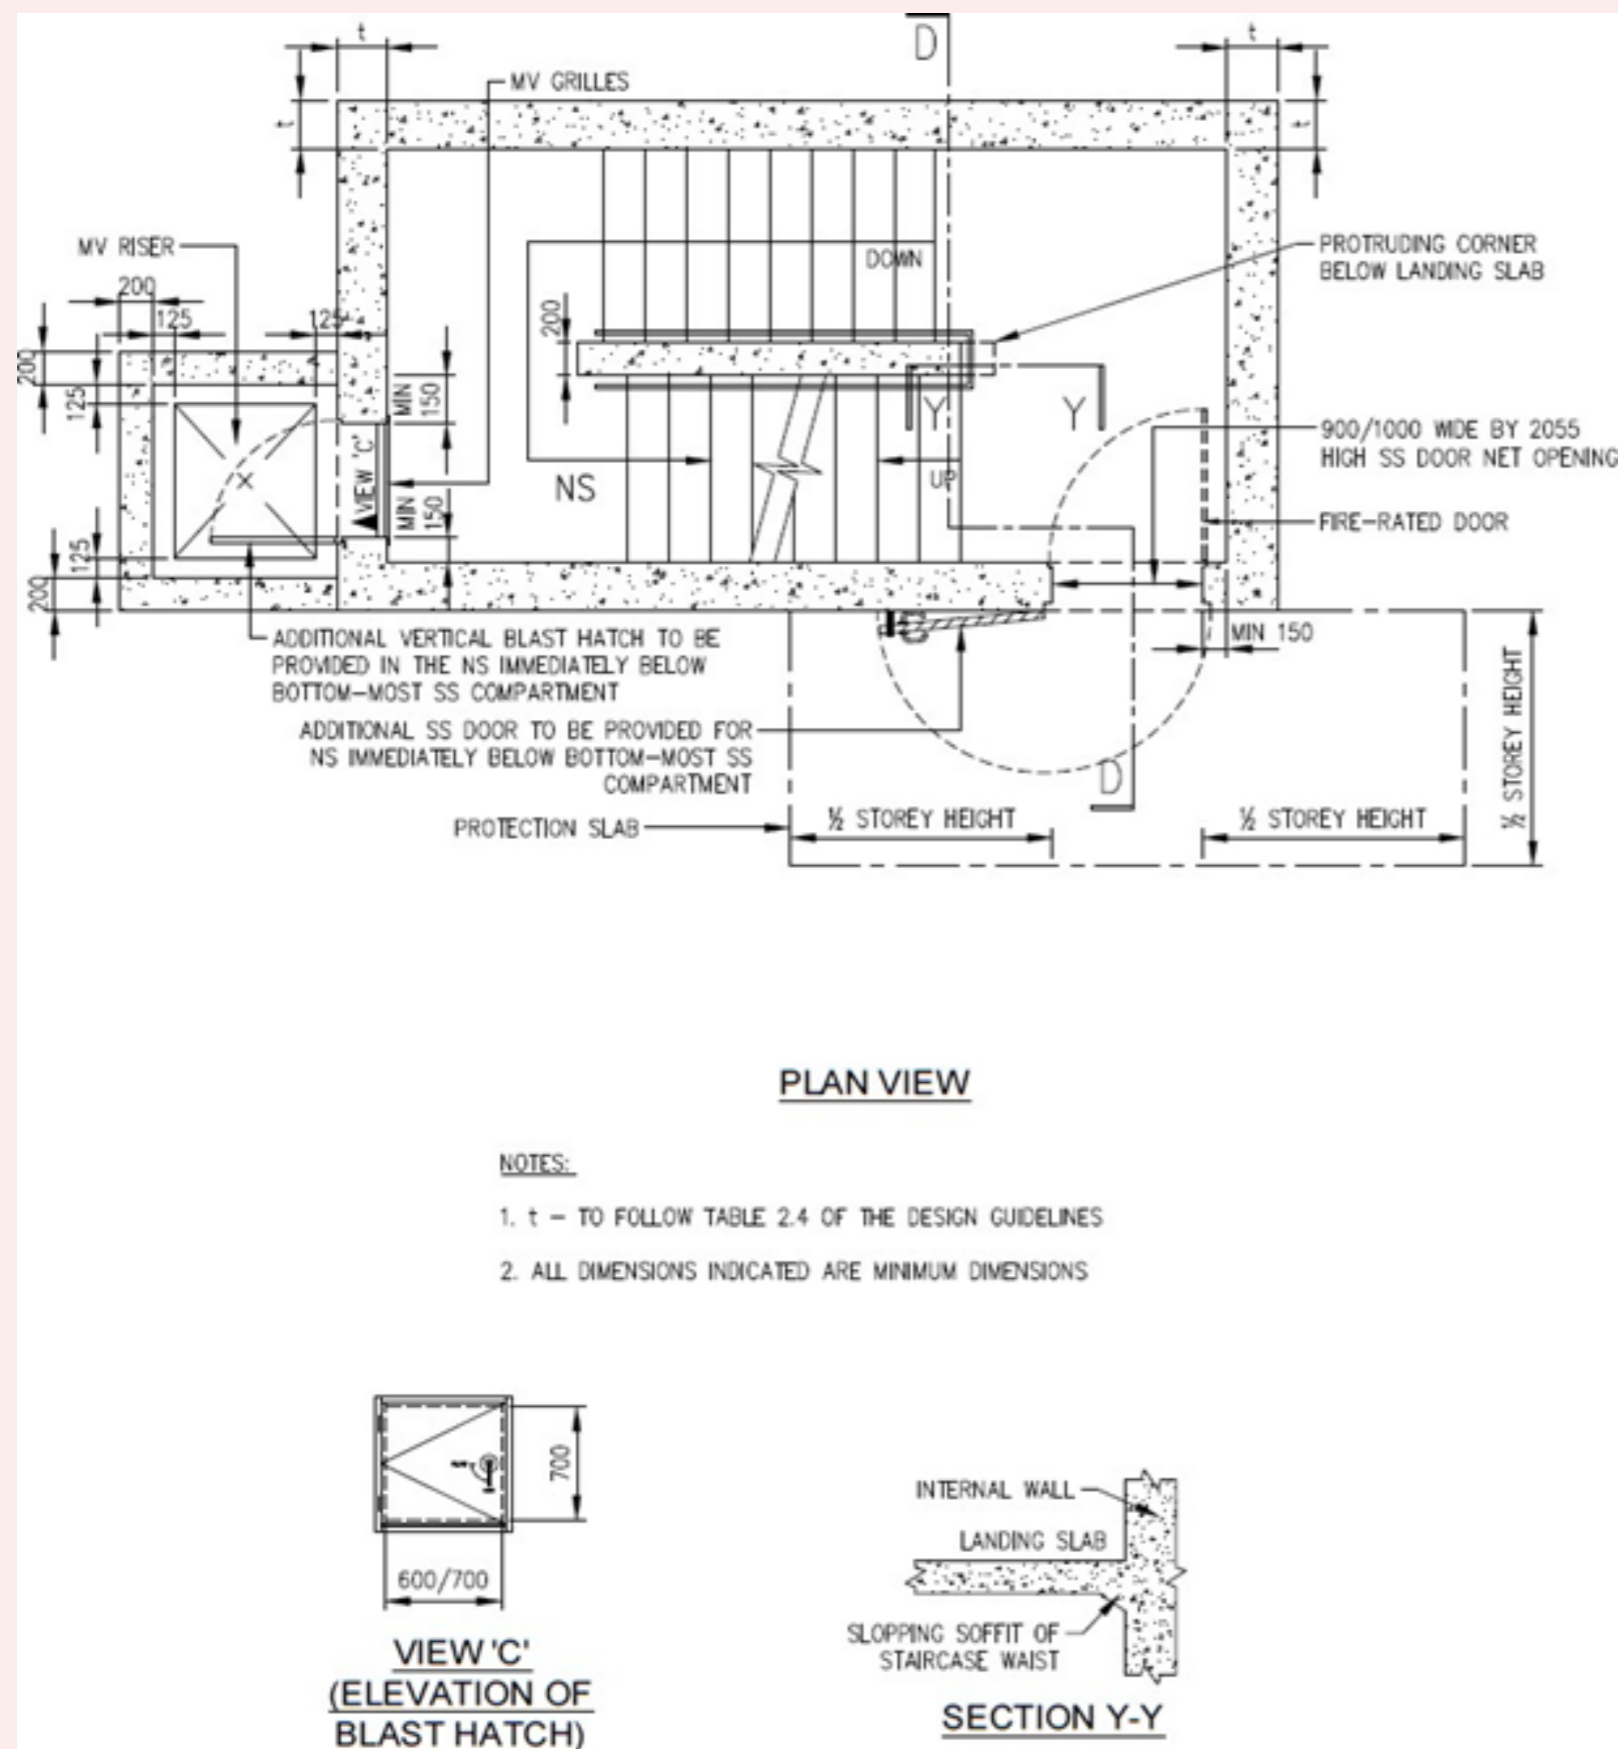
(h): DETAIL SECTION OF SS AND NS AT FIRE DISCHARGE STOREY
